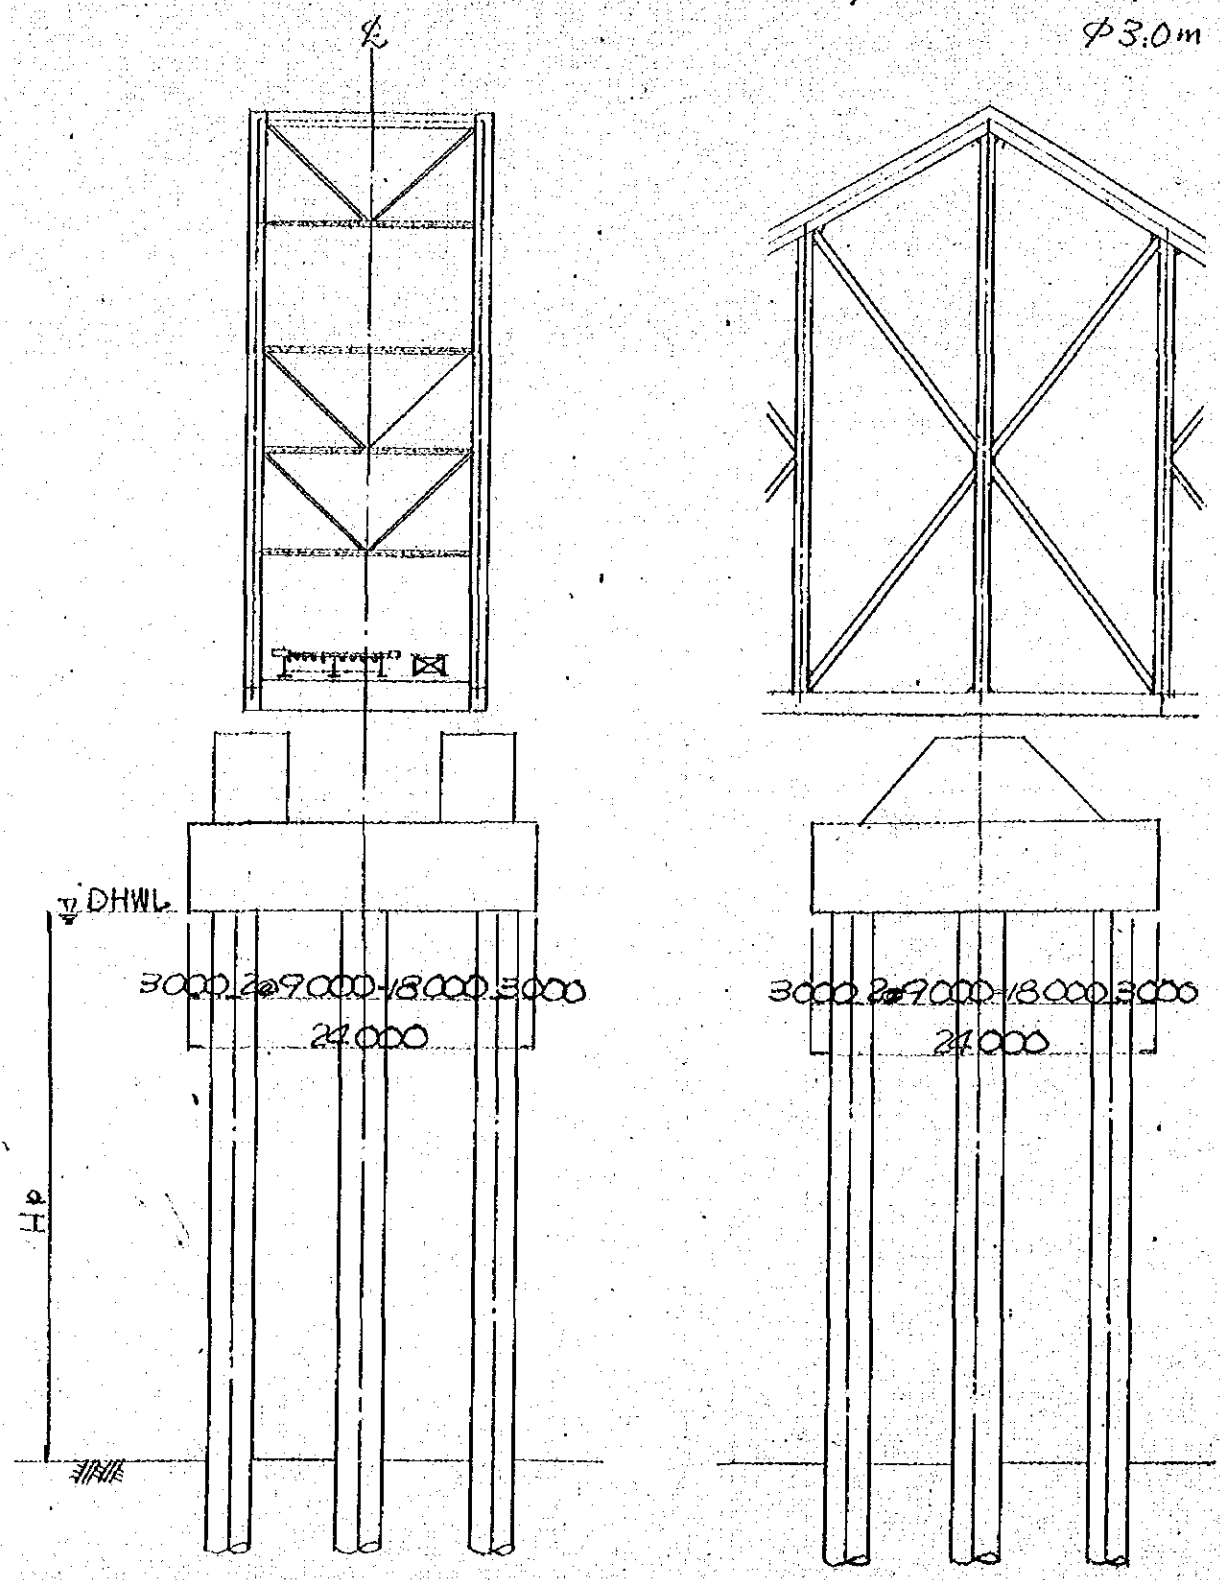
Outline of structure of multi-pile foundation.
